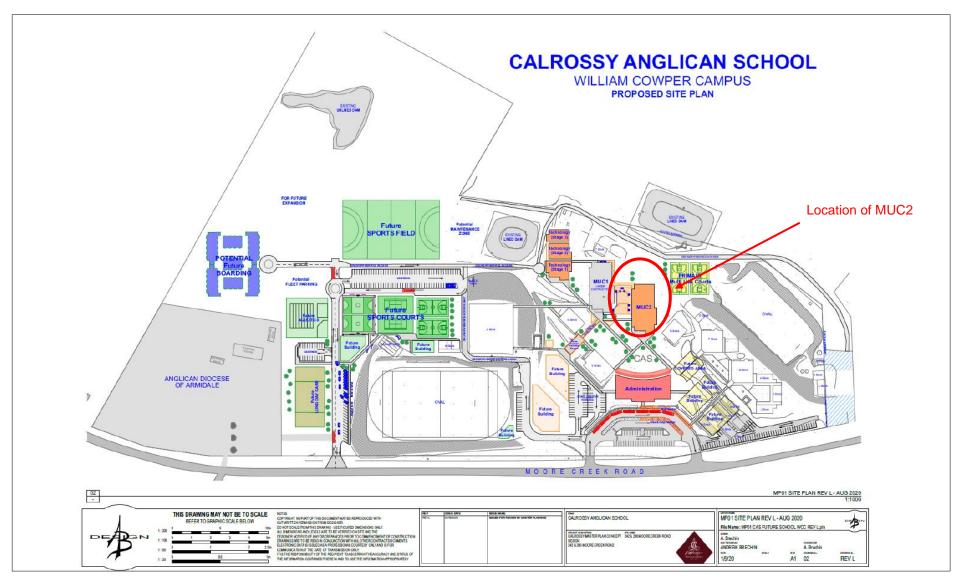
Location of MUC2 within the Calrossy Anglican School - William Cowper Campus Site Plan
